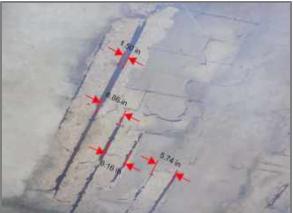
Underside of deck spall from field investigation. Note that scaled dimensions from this photograph indicate a transverse rebar spacing much closer than 18".
